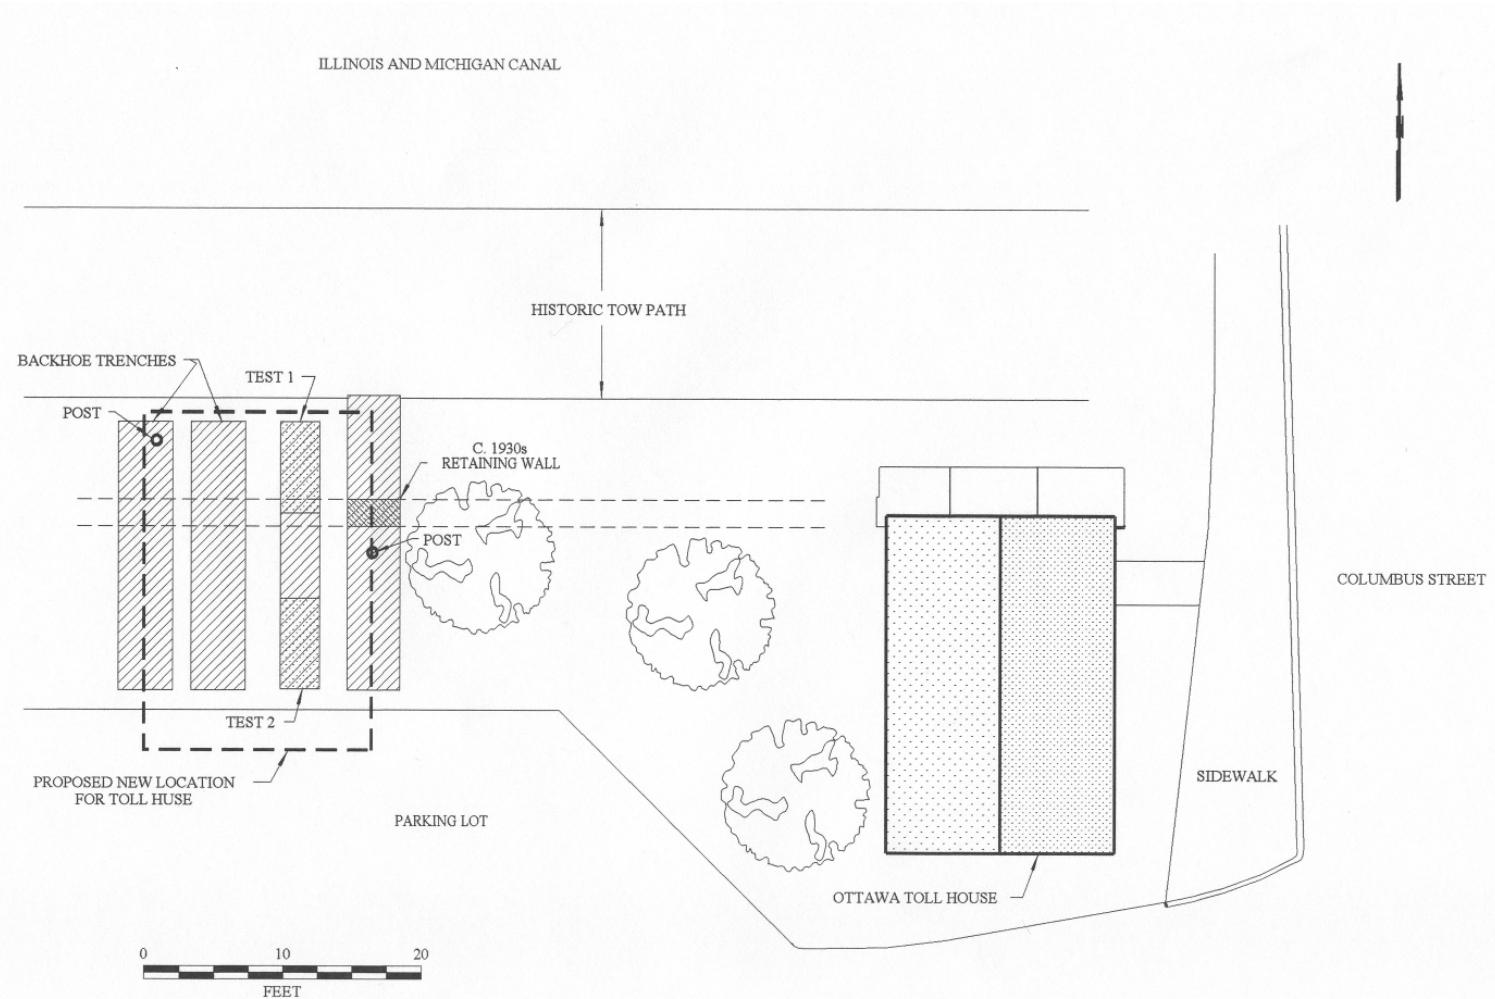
Site plan showing the area tested as part of the Ottawa Toll House relocation project. Excavation units and features identified are noted (FRR 2003).
